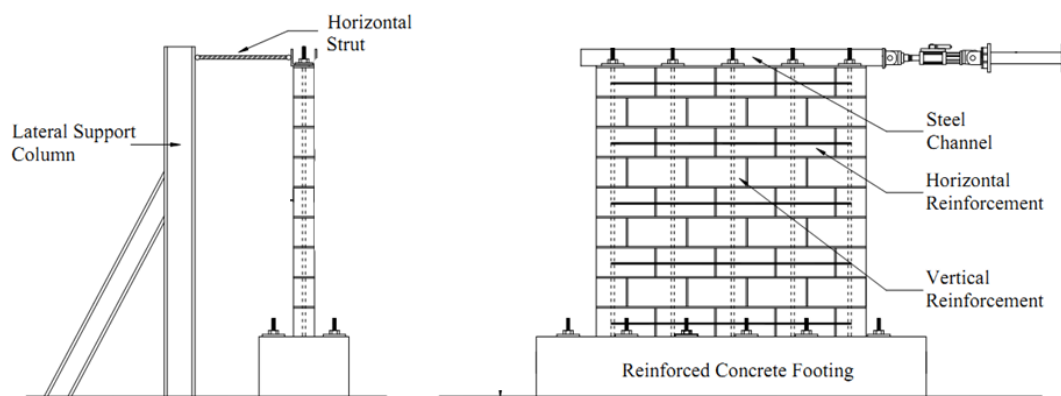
Test setup for walls A1 and A2 (Voon, 2007)
